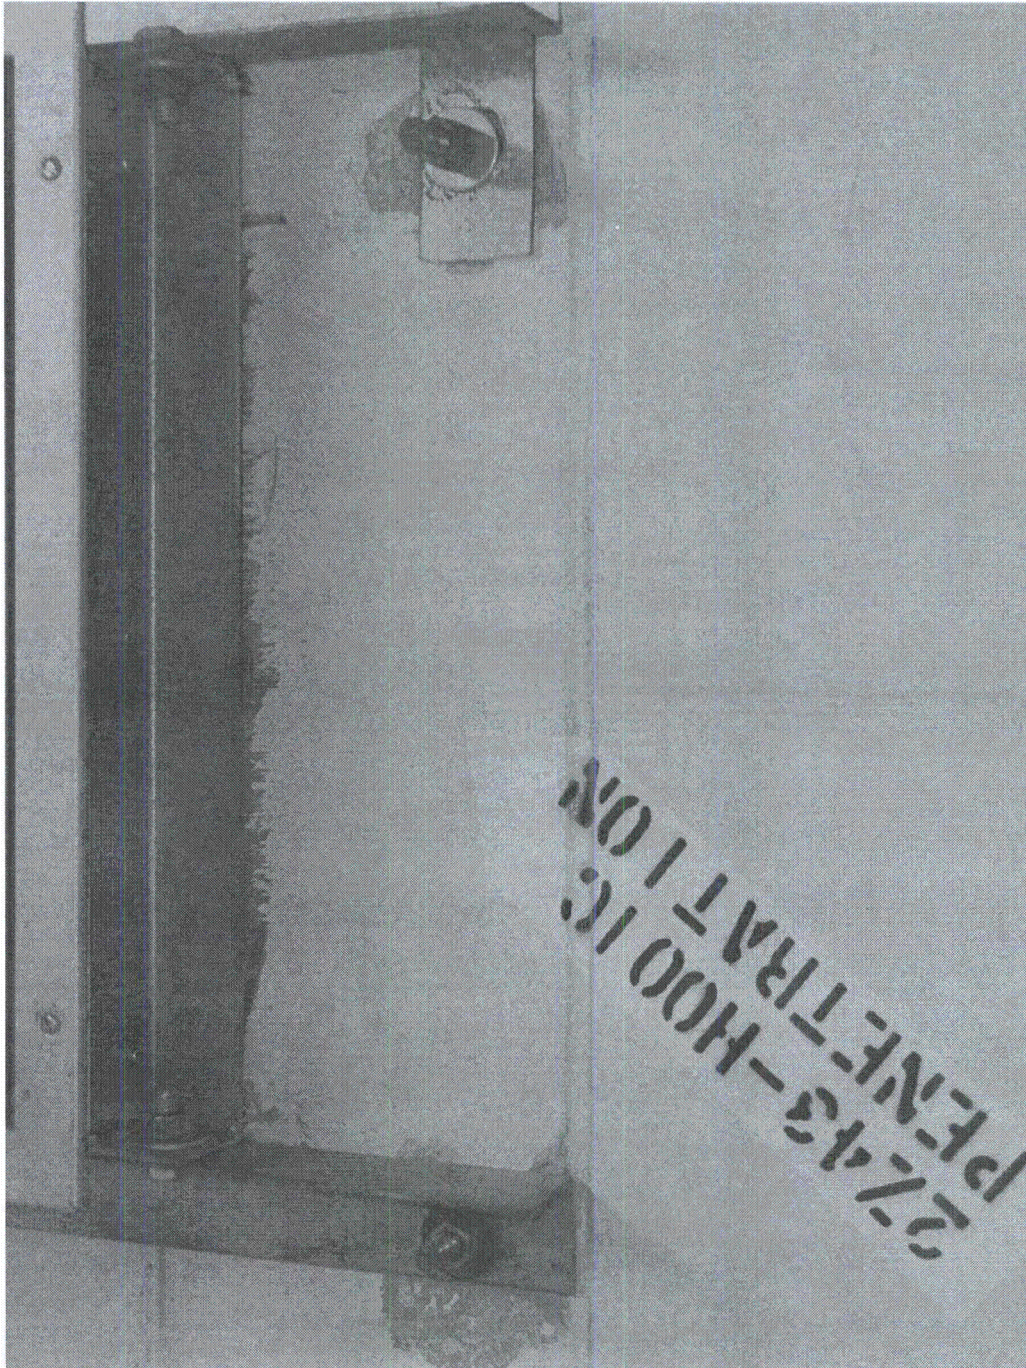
Spalling at HVAC Support (TC-T12 Control 112)
